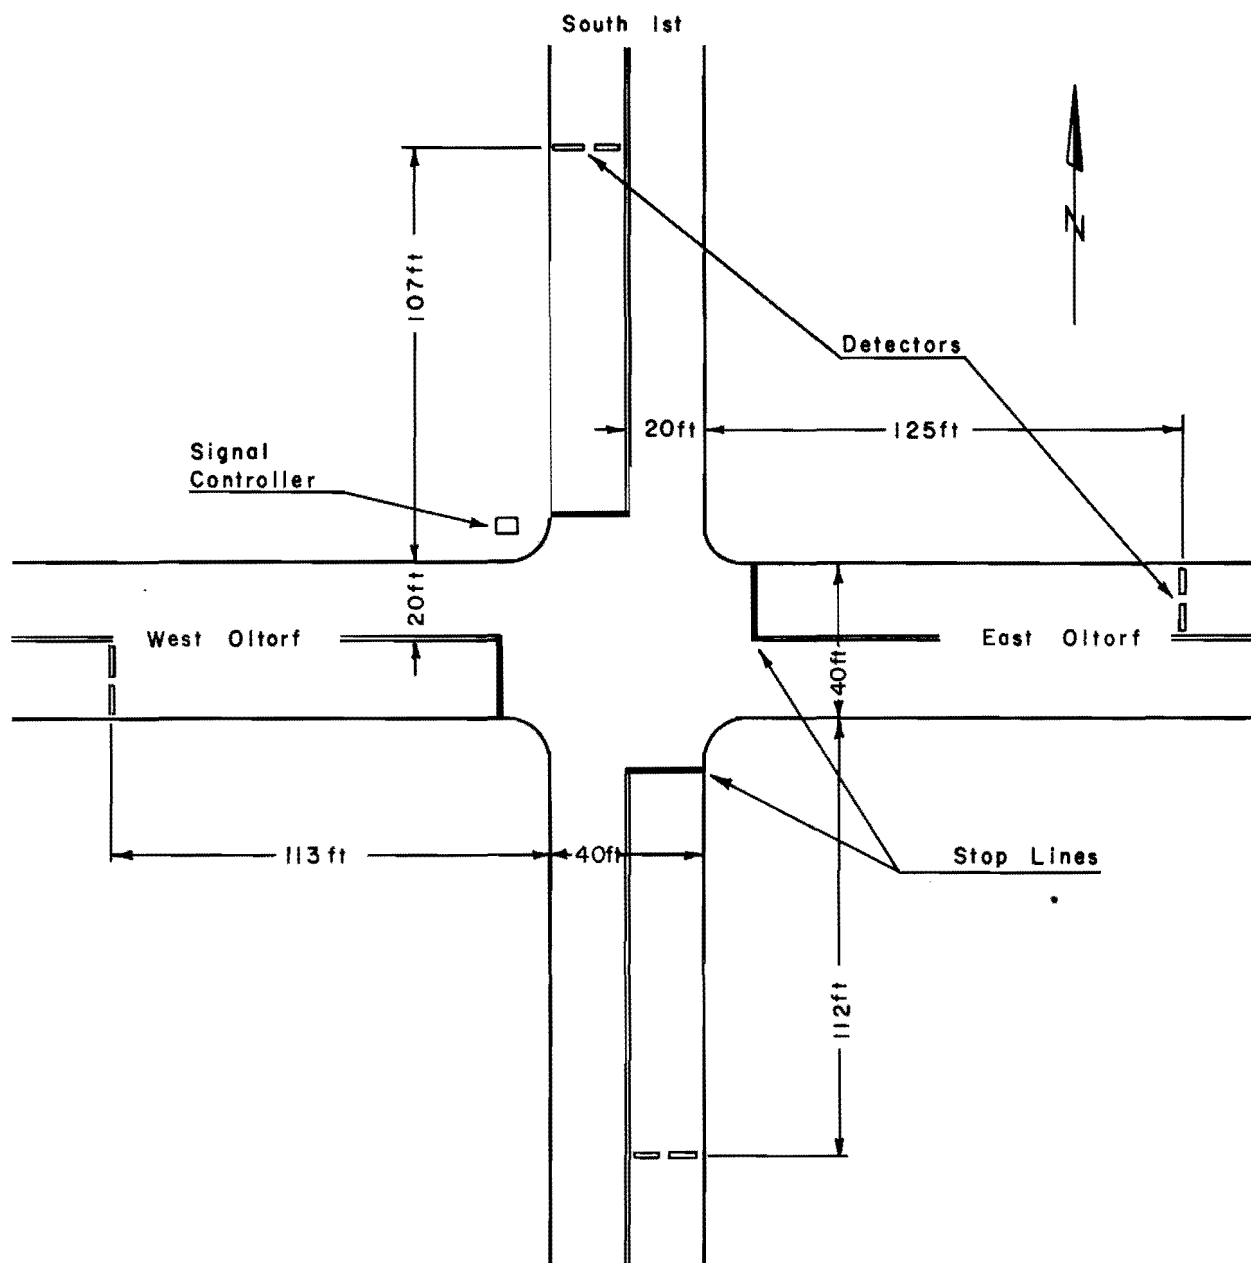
Geometric layout of South First and Oltorf intersection (signalized).
